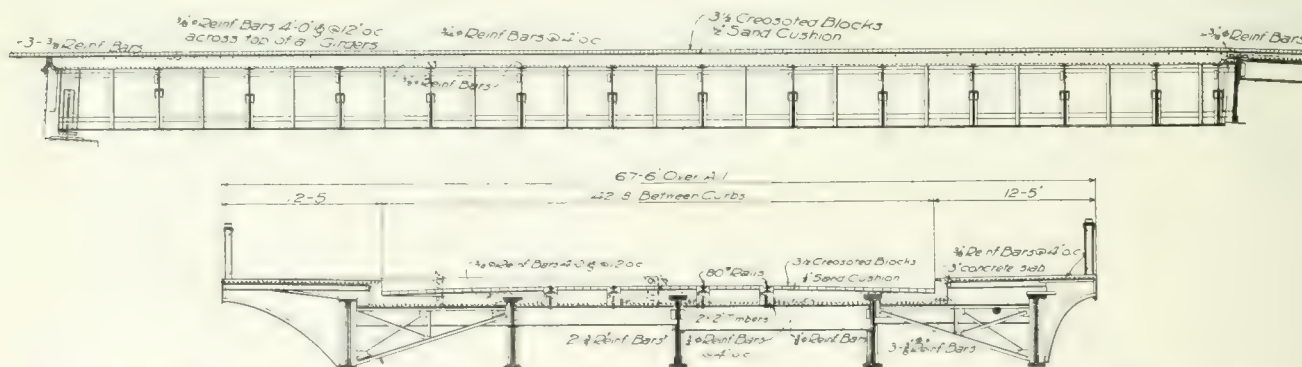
Longitudinal and Cross-sections of Span Between Abutment on the Winnipeg Side and Pier I.
